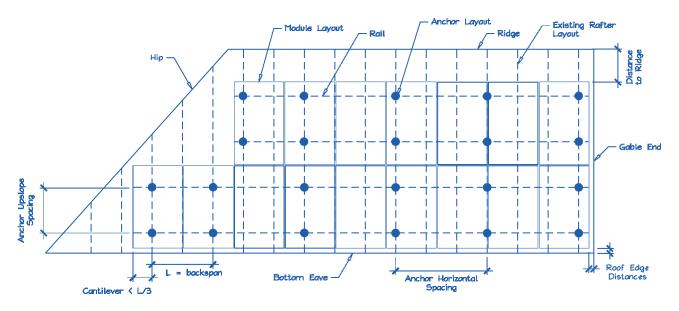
Sample Solar Panel Array and Anchor Layout Diagram (RoofPlan).
